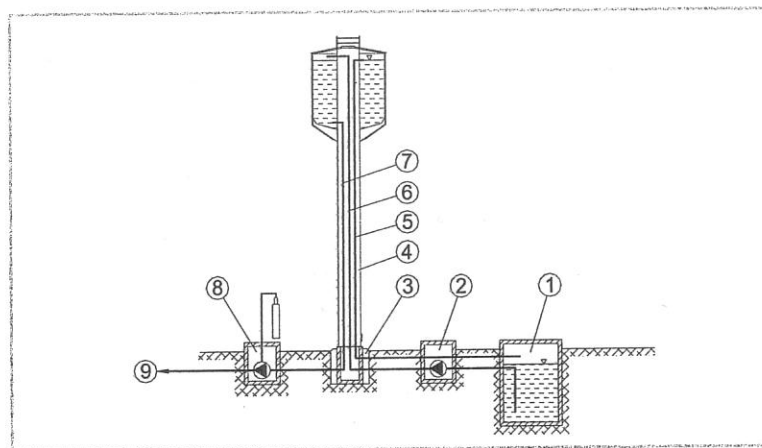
1. - well, 2. - pumping station, 3.- water tower basement, 4.- water tower, 5. - over flow pipe, 6. - riser pipe, 7. - outlet, 8. - chlorination and filtration unit, 9. - water outlet to distributor.
